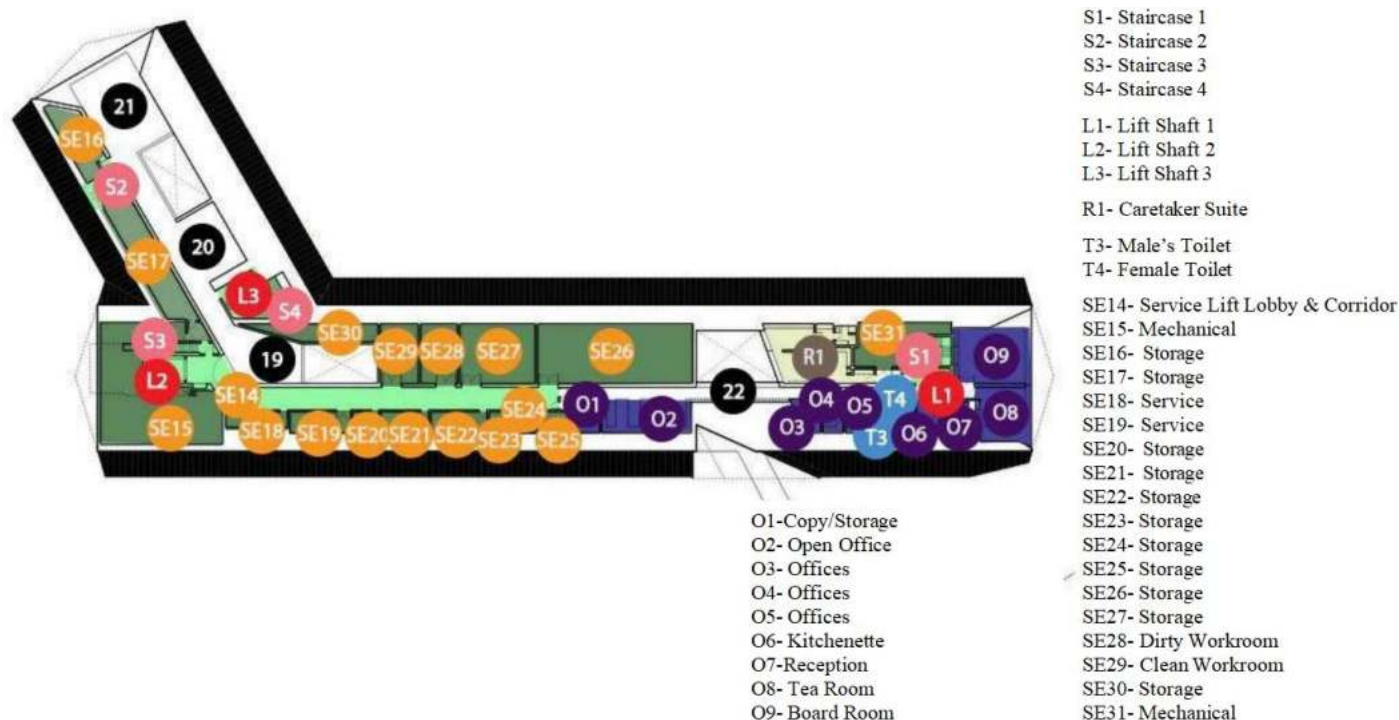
2nd Floor Plan Redrawn from source: (Audain Art Museum / Patkau Architects, 2021)
